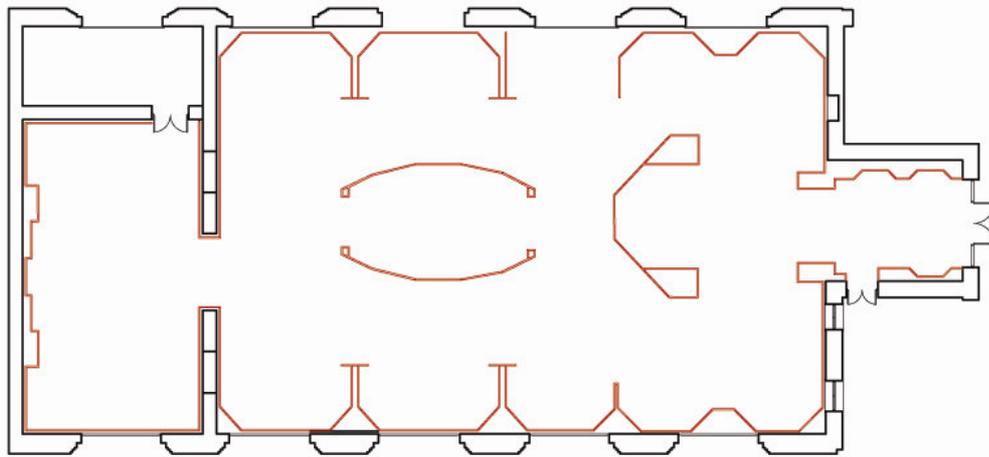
Plan of the Exhibition Hall in APIKAM
